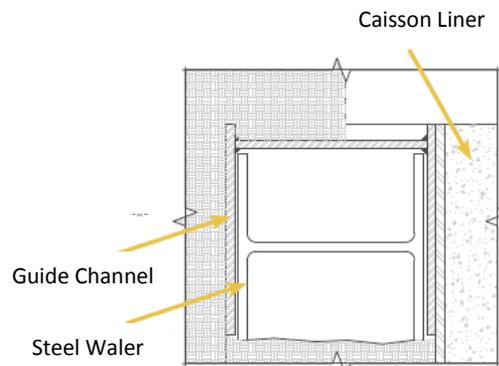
Guide channel containing steel waler fastened to caisson liners
